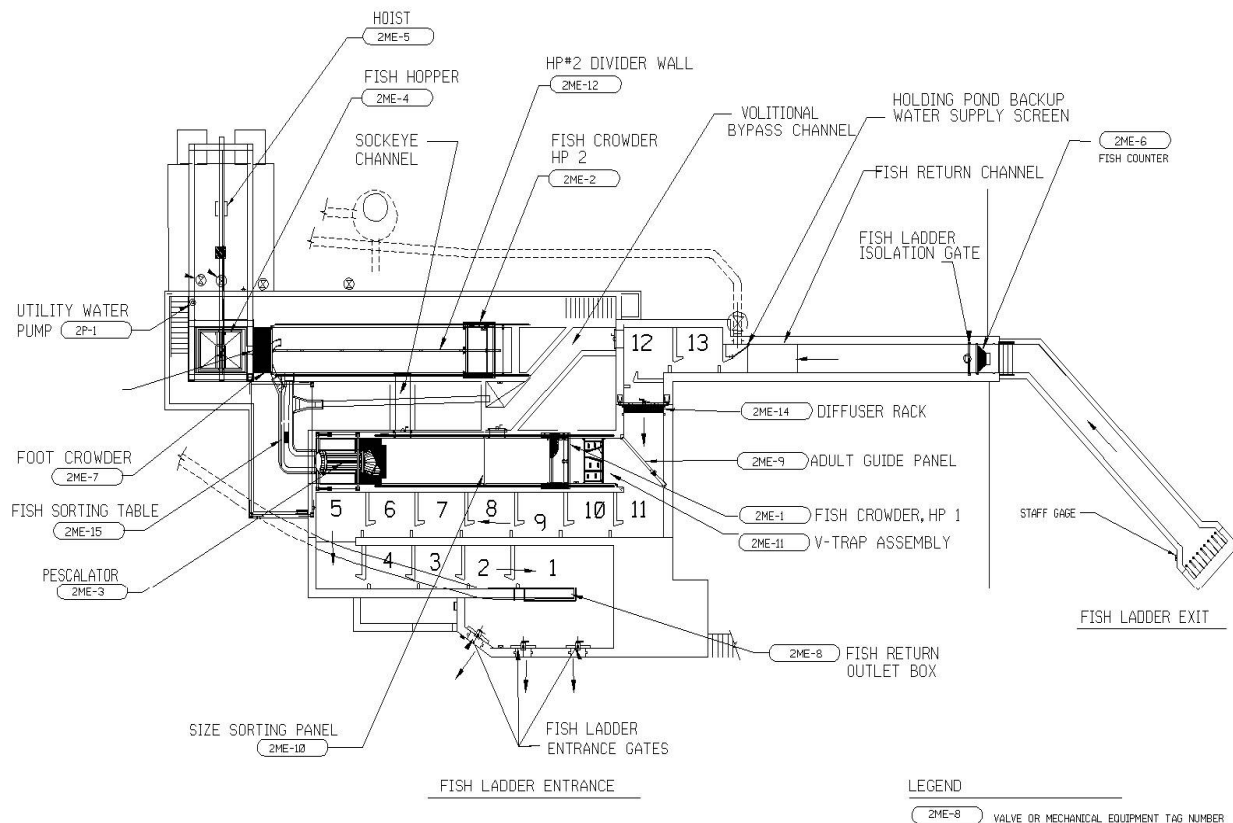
Layout of Landsburg Dam Fish Ladder and Sorting Facility
